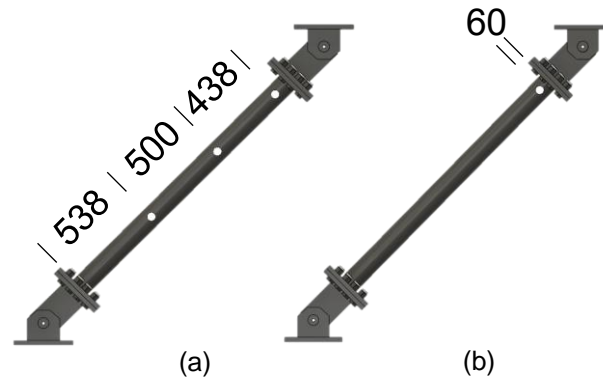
Hole layouts for foam insertion for (a) F11435H1 with three 22 mm diameter holes and (b) F11435H2 with one 16 mm diameter hole (units: mm)
